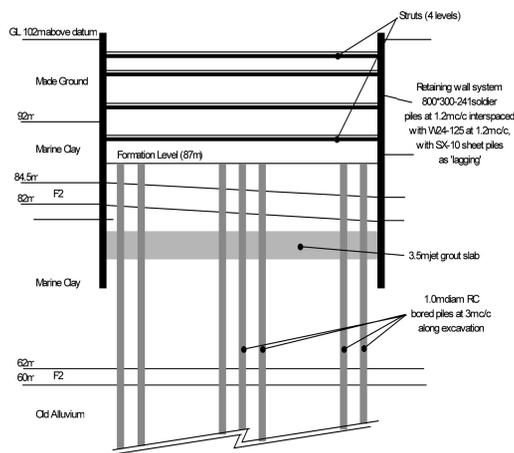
An example of a ‘floating’ wall system, used for part of the KPE construction.
